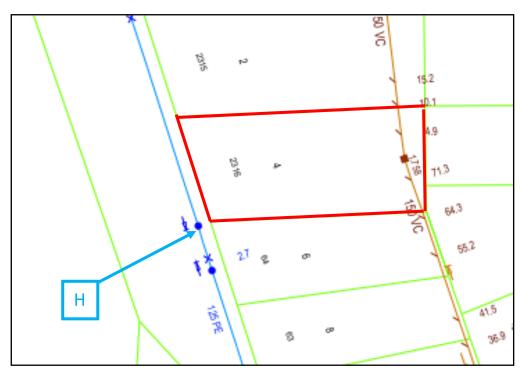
Section Sydney Water Reticulated Mains Water Supply Layout Plans
